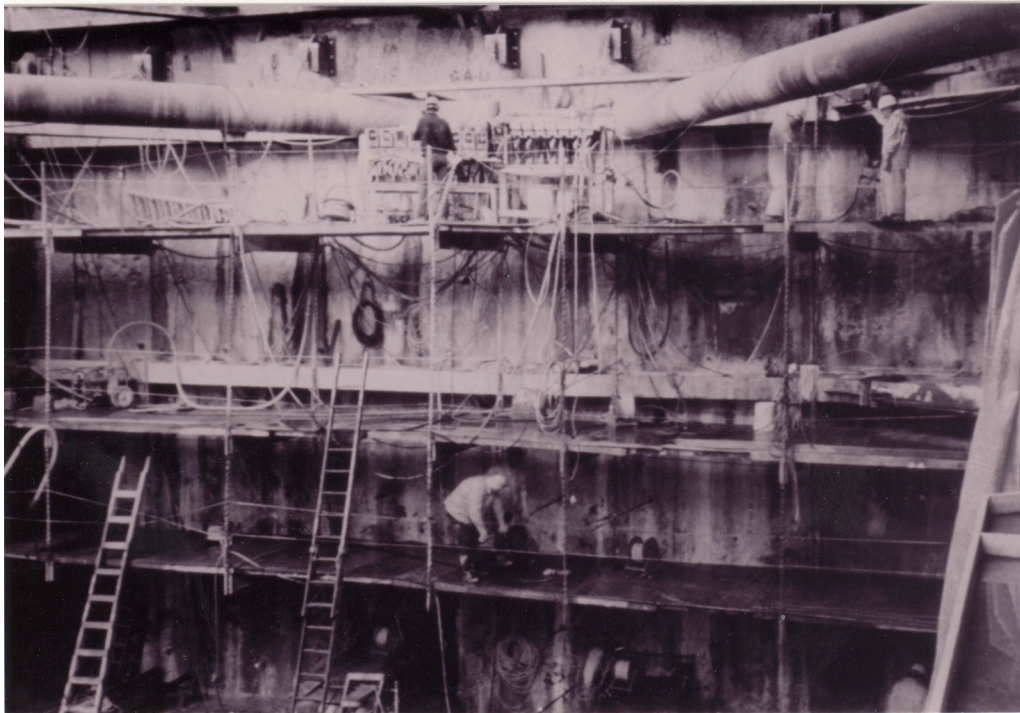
Full-Face Grout Encapsulation in Los Angeles Subway.
